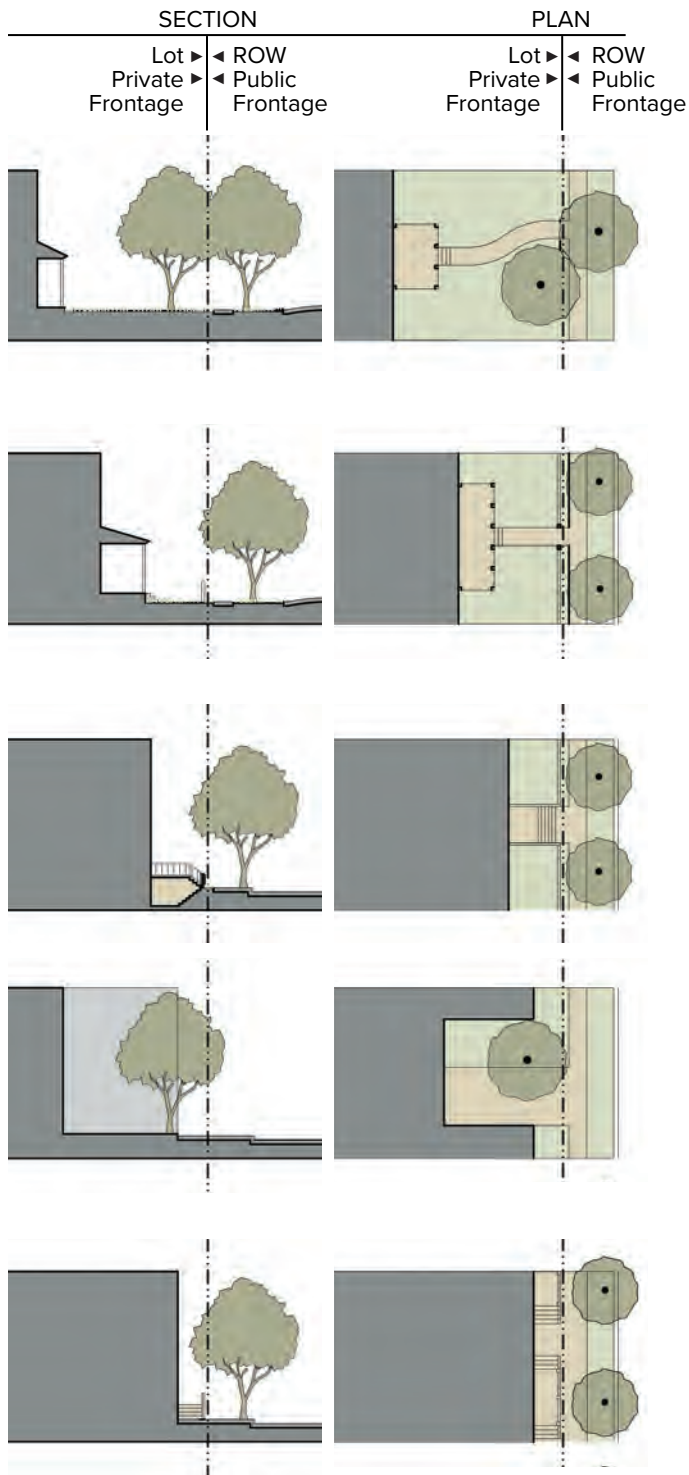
Graphic illustrating plan and section view of Frontage types Common Yard, Porch & Fence, Terrace or Lightwell, Forecourt, and Stoop.
